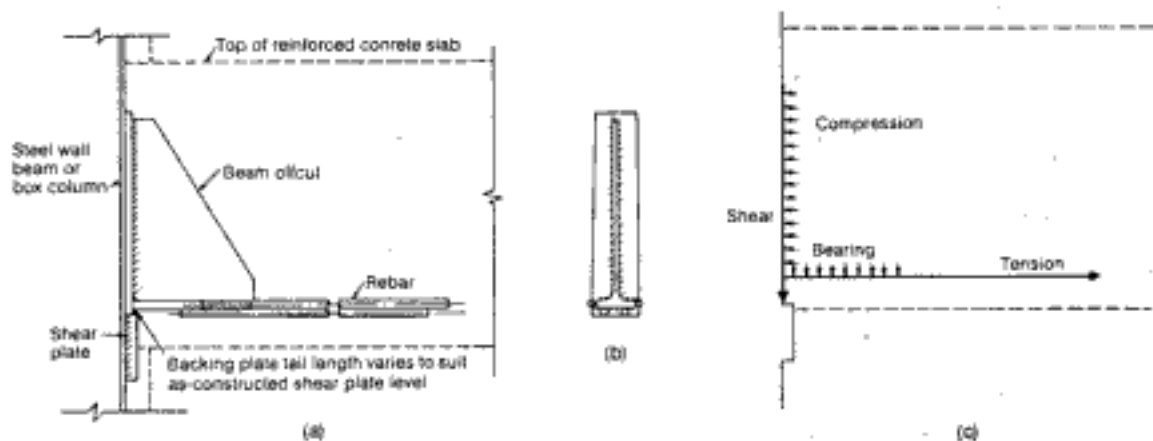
Argyle station, Hong Kong Metro: detail of shear shoe and plate to transfer high loads from slabs to secant pile walls: (a) side view; (b) end view; (c) force transfer (McIntosh et al.³)
